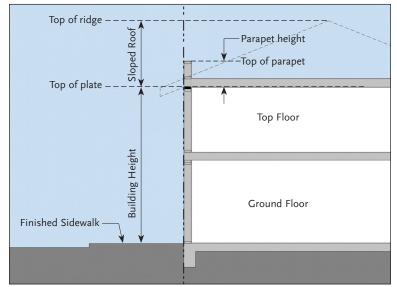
BUILDING HEIGHT AT SETBACK
